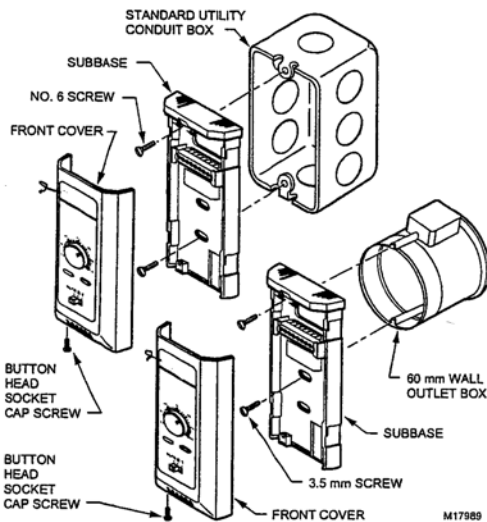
Mounting zone sensors on standard utility conduit box or 60 mm wall outlet box.
